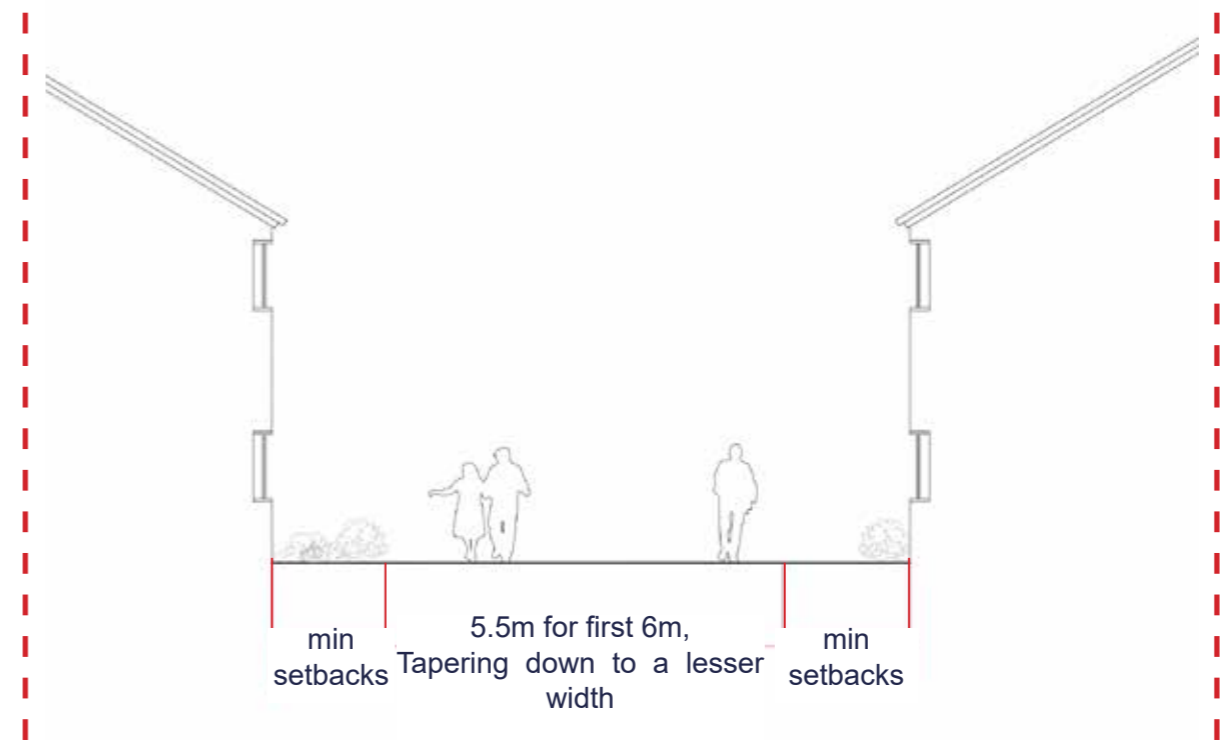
Type H Shared Private Drive section with defensible space to residential frontages. (Not to scale)
